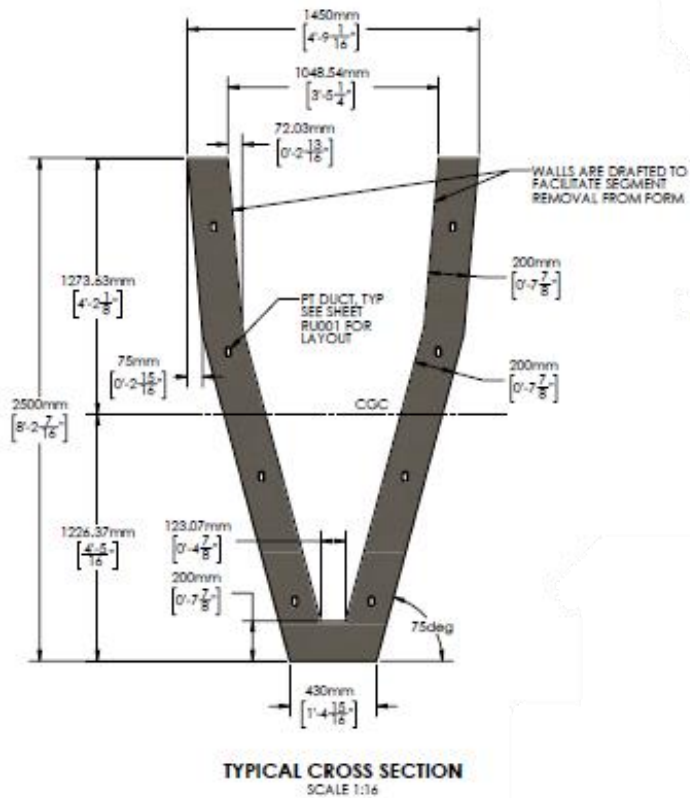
Reaction ring design: U-shaped cross-sectional profile
